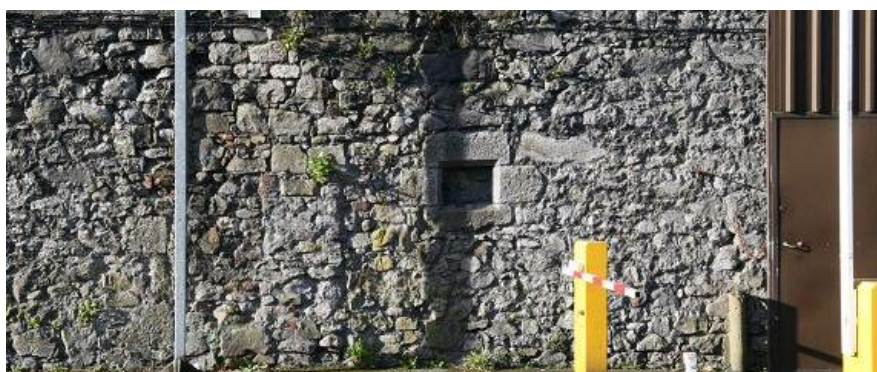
Medieval ope in stone wall within car park adjoining 22 Vicar Street. There is no brick in the masonry beneath or to the right of the ope. To the left, however, there is a great deal of brick fragments, indicating a later alteration or reconstruction.
